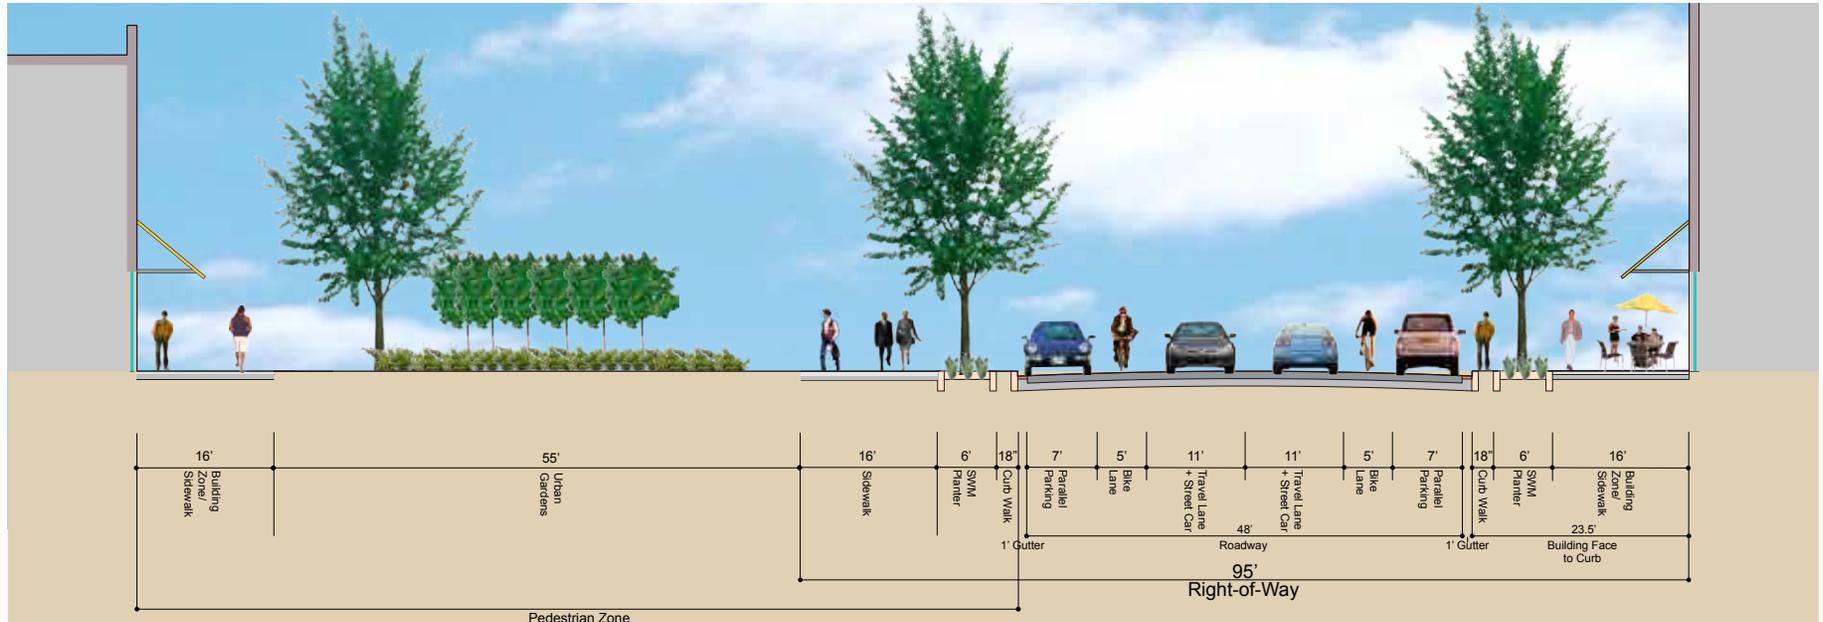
Street Section A. Source: Perkins+Will.
